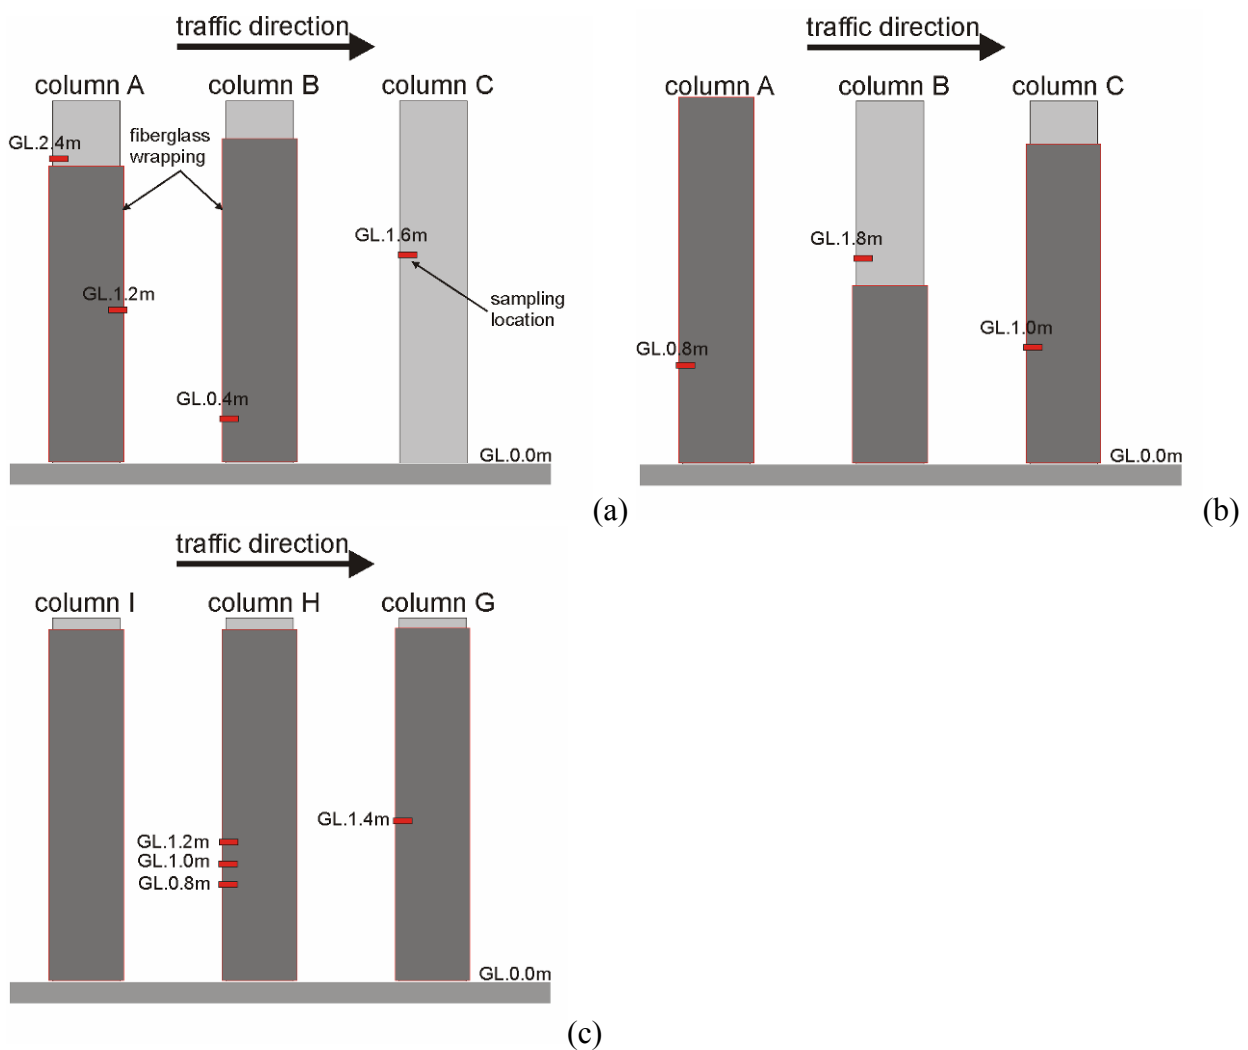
Location of extracted powder samples: (a) bridge B-28-45, (b) bridge B-53-71, and (c) bridge B-13-144.
